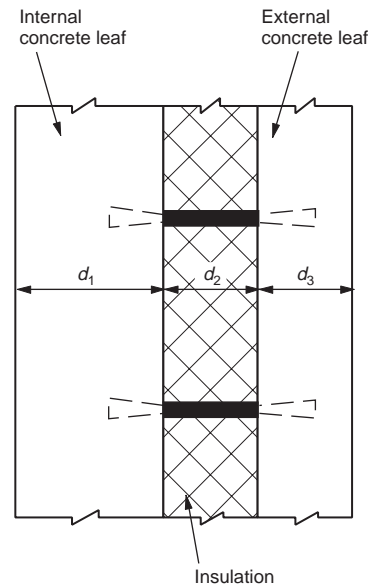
Typical cross-section of a sandwich panel (courtesy Reinforced Concrete Council)
